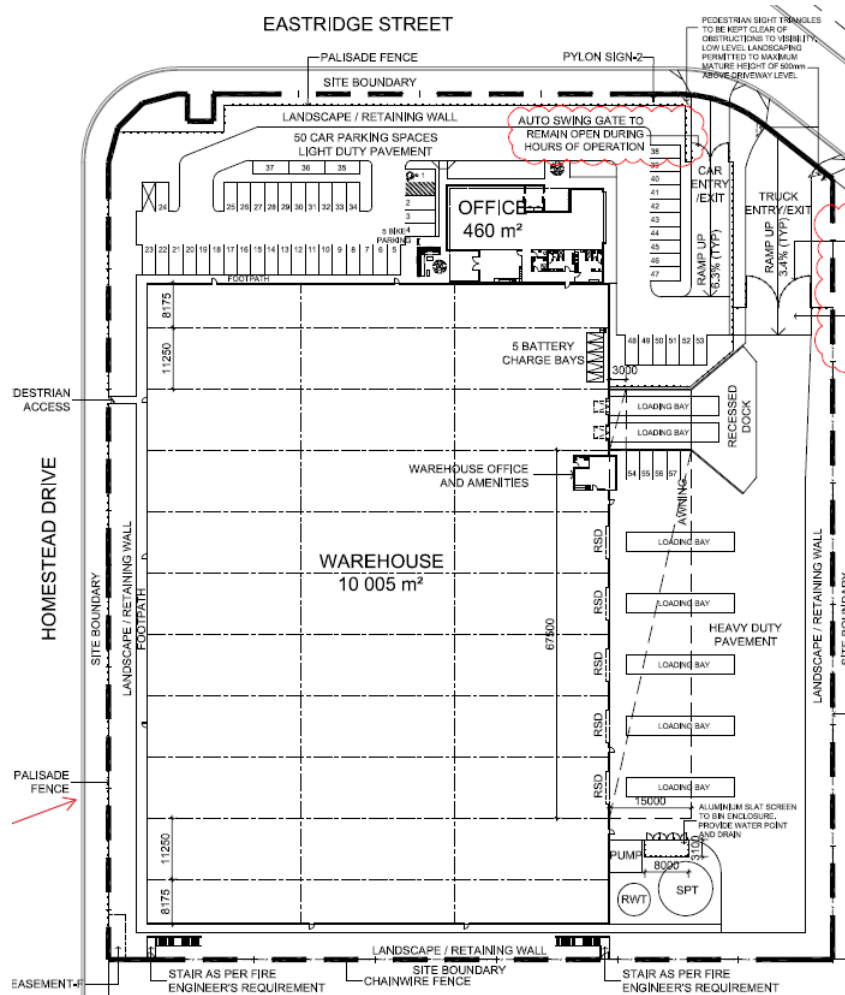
Approved site layout – COM/2023/162 (GDP file, 2024)
